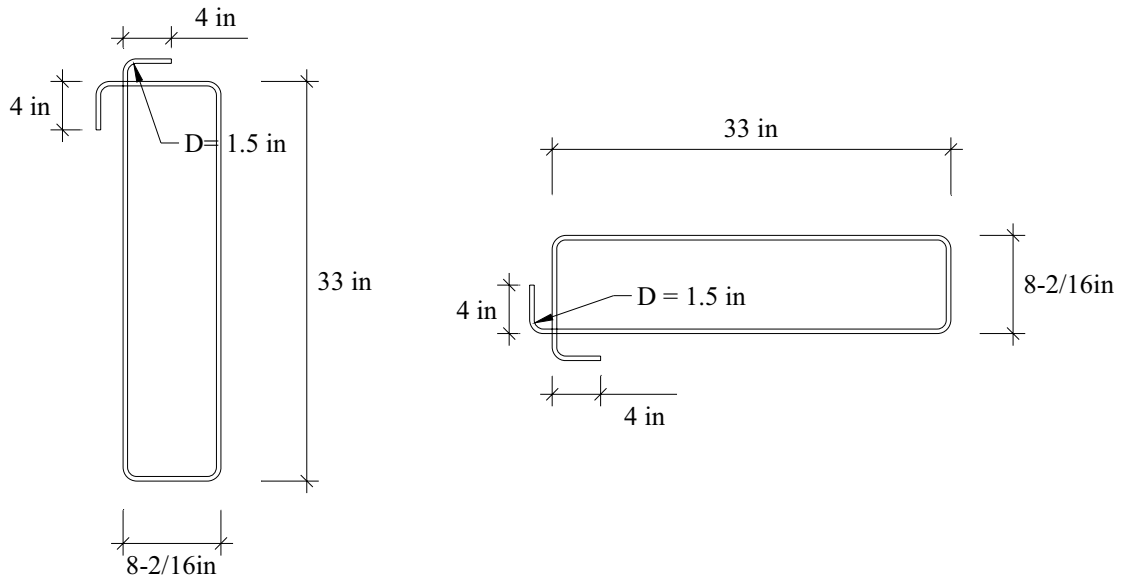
Section A-A; Cross Ties (A) #3 Details; Specimens G1 & G2
